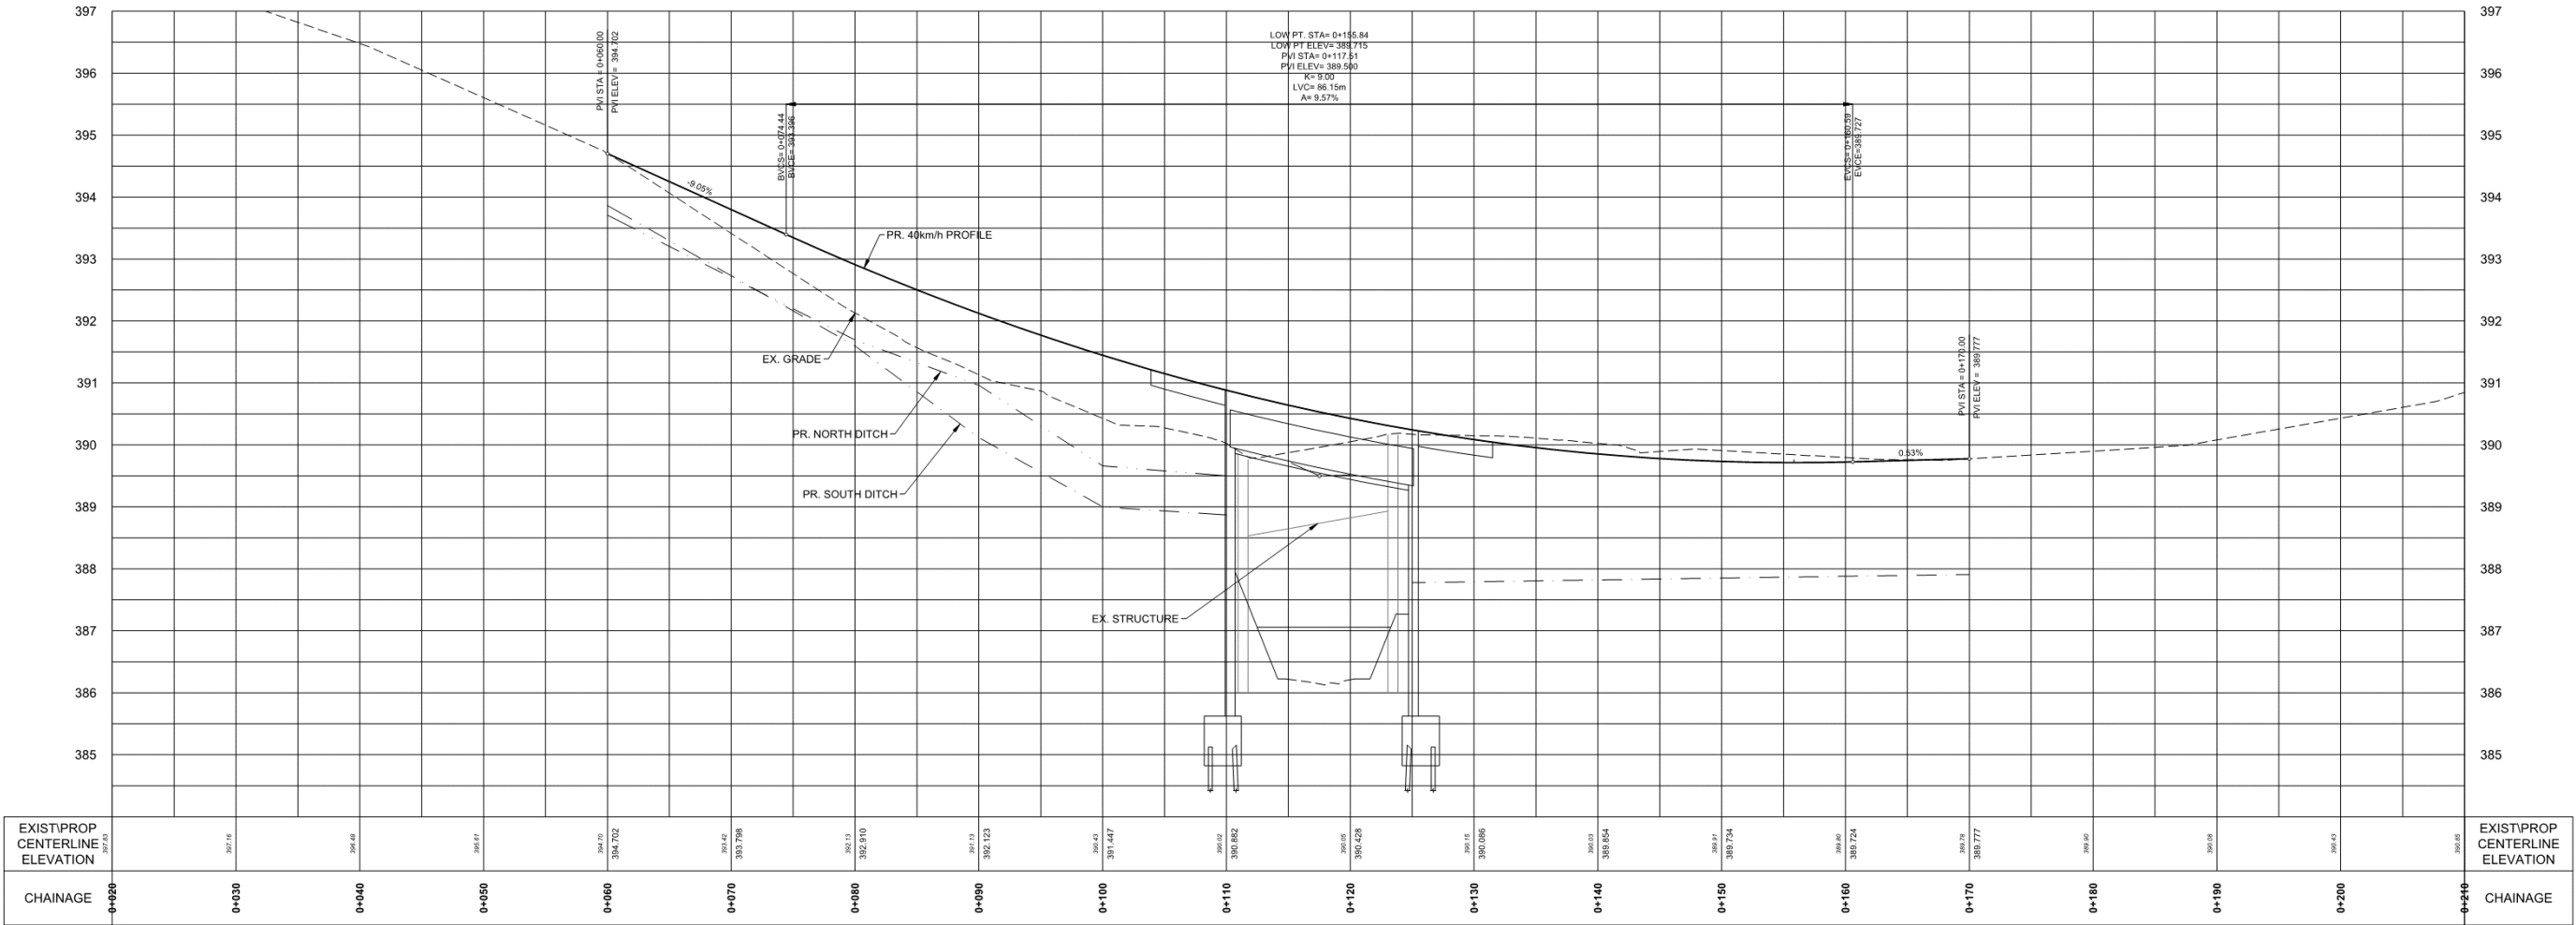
Elevation View of Conceptual Design, Bridge 28-P
